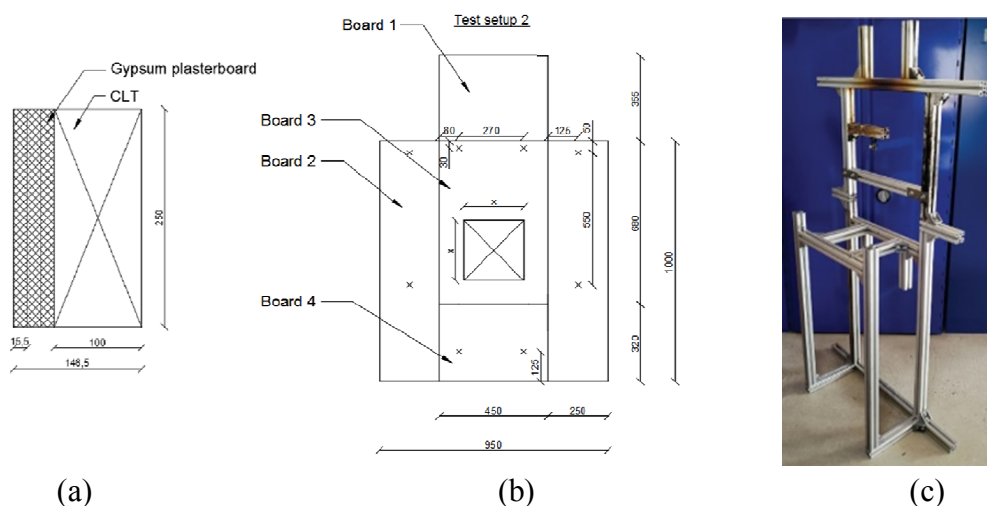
(a) Experiment specimen cross-section, (b) noncombustible boards (NCBs) setup, (c) specimen setup aluminum frame.
